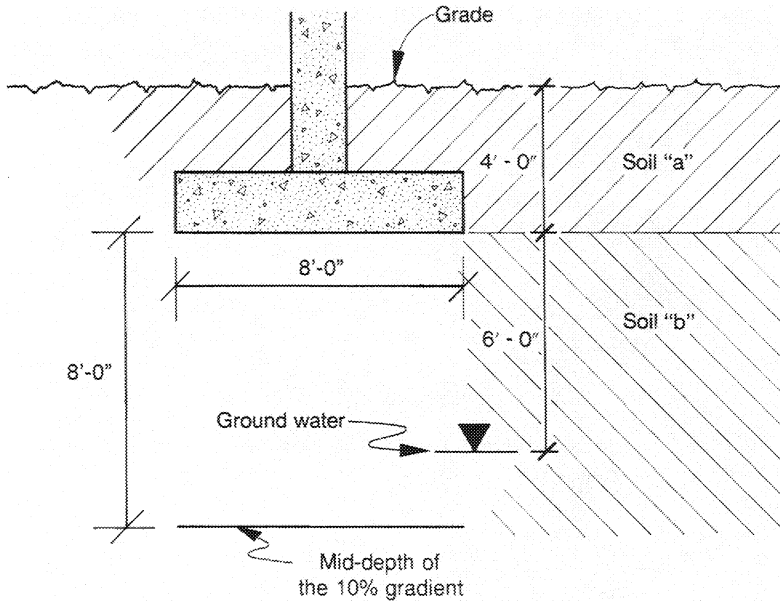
Examples 6-3 to 6-6—General conditions.
